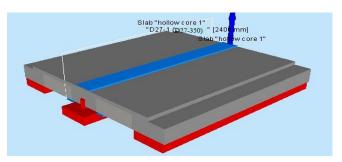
Full Scale Steel Beam Model with Slab on Both Side
